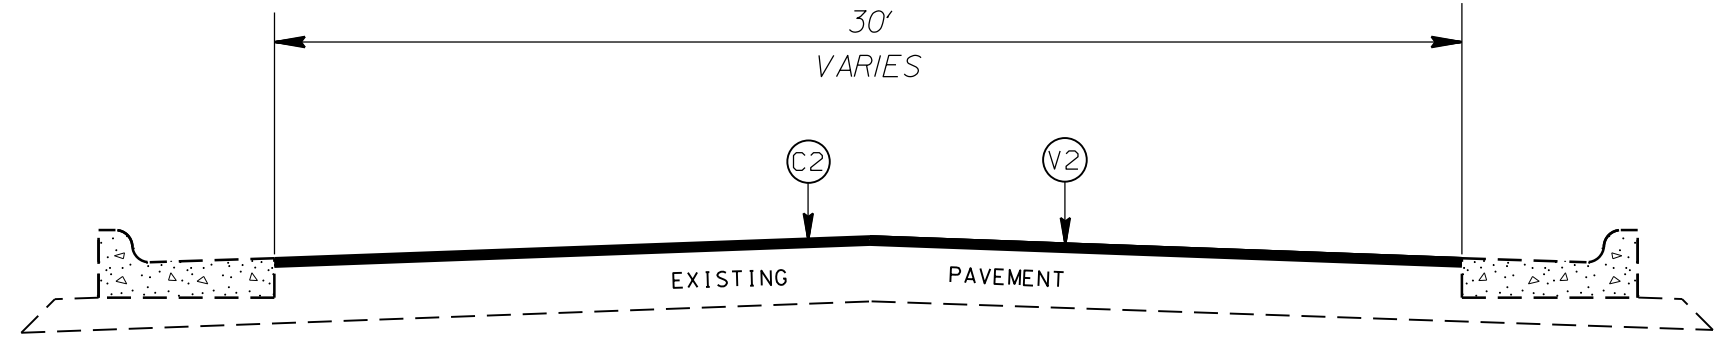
DETAIL FOR PROFILE MILLING (0" TO 1.25")
